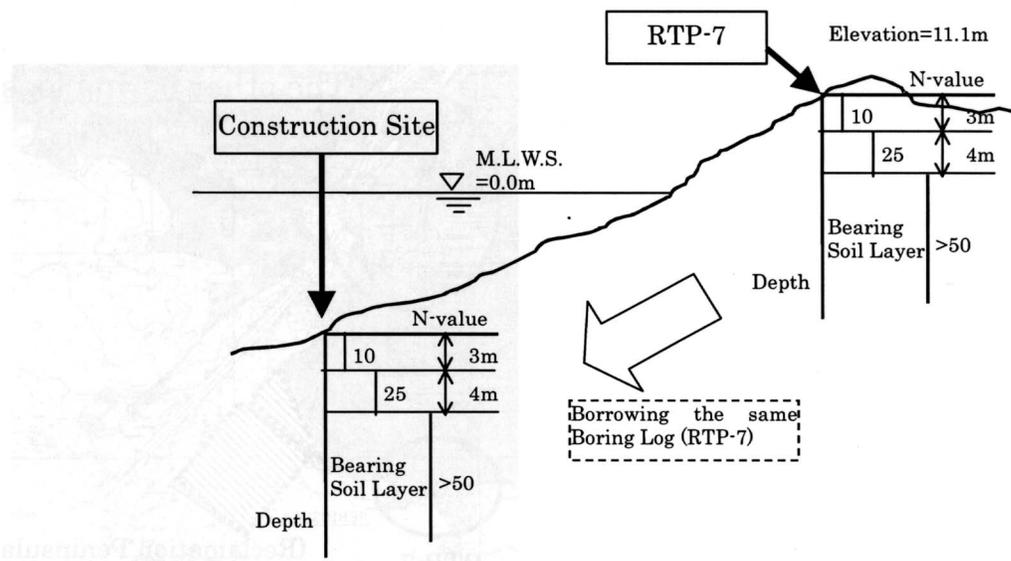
Assumption of Soil Condition at Construction Site
